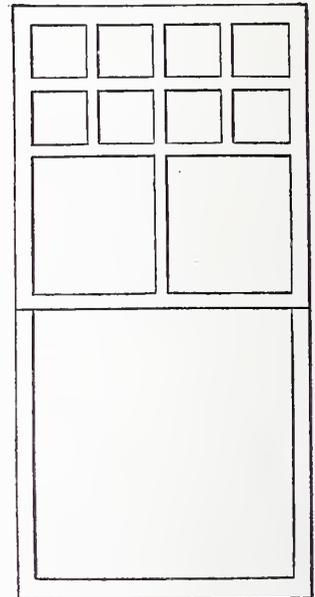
Elevation of Sash in Second Story.—Scale, 1/2 Inch to the Foot.
